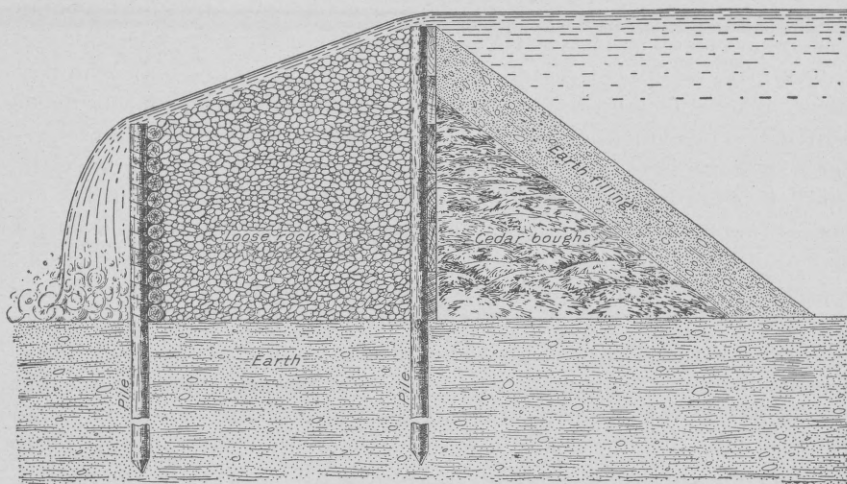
Cross section of Sieker's dam on San Saba River.
